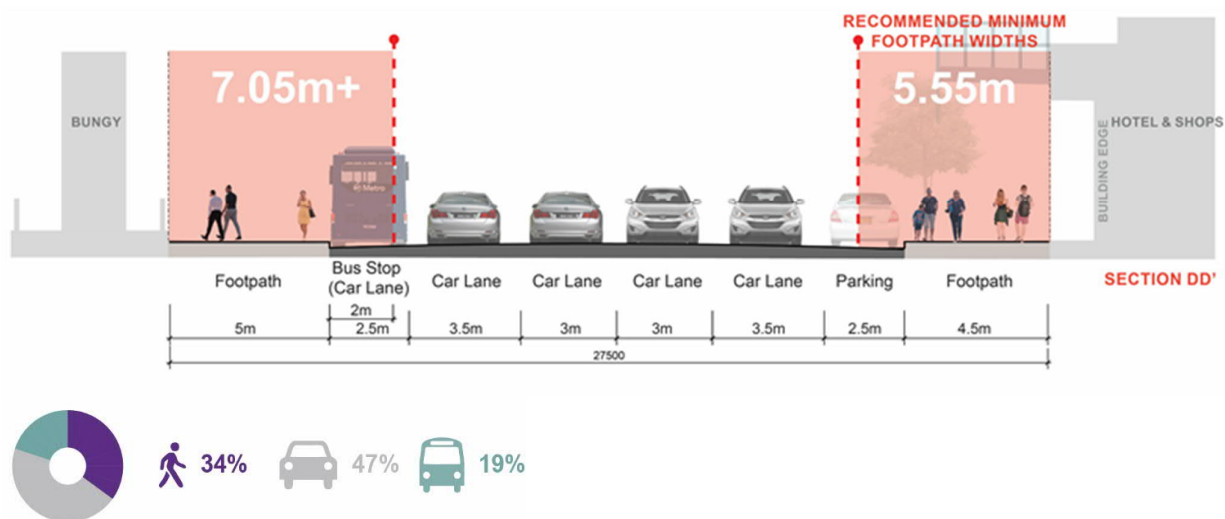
Typical cross section along Victoria Street (larger image provided in Appendix E, recommended footpath widths based on context²²)
